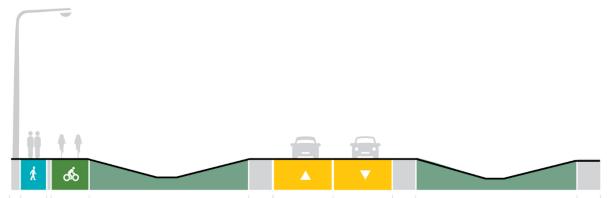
Coatesville-Riverhead Highway typical 33 m rural cross section
